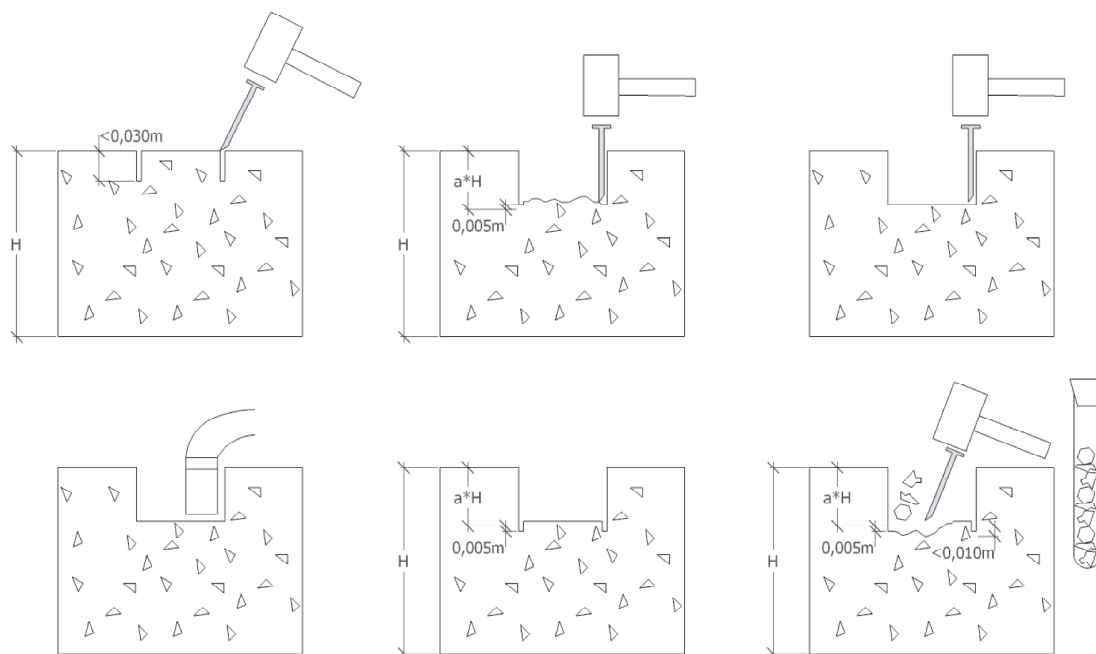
Procedure of extracting a sample from a concrete floor slab
